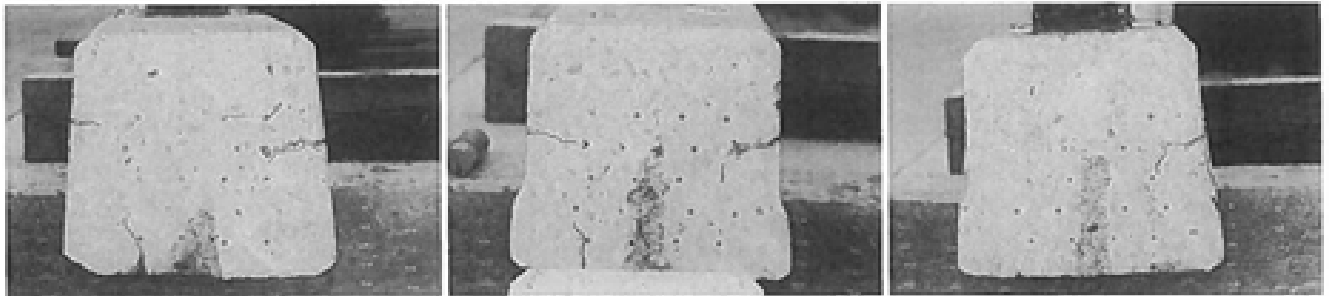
South end cross-sections of tie NDT #1 at saw cuts 4 inches (left), 8 inches (center) and 14 inches (right) from end, cracks outlined in red.
